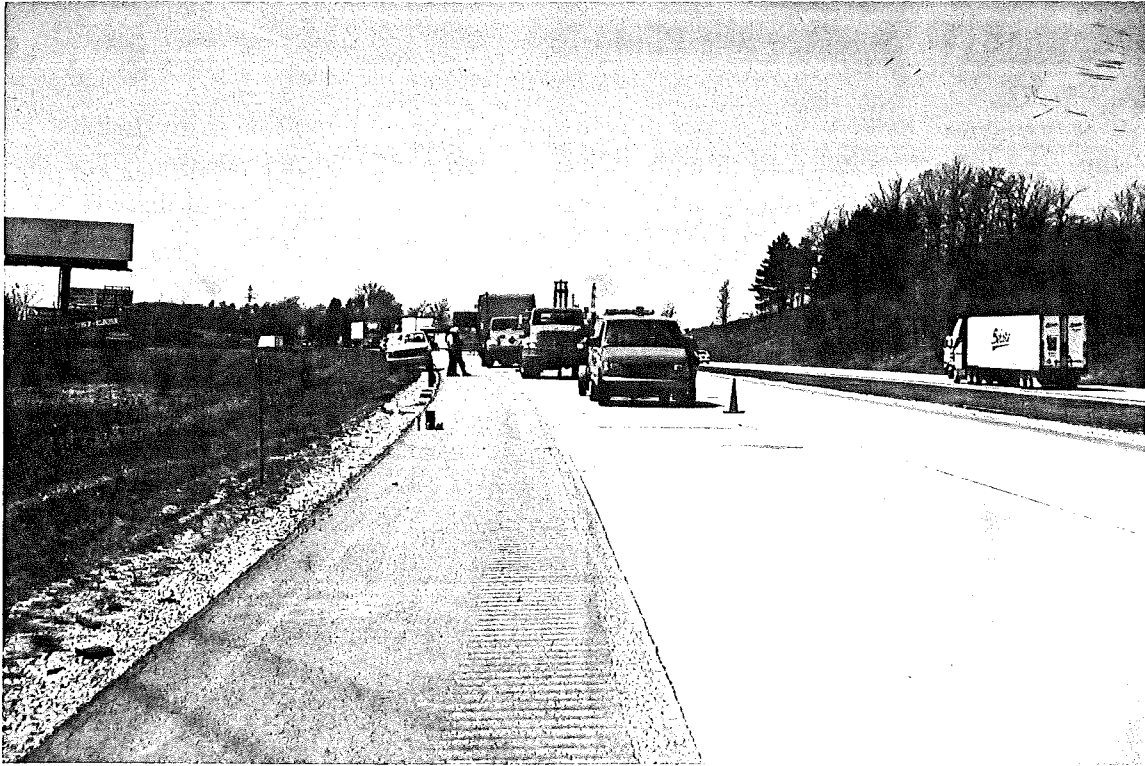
An overview of CSN# 11017-32516A (Section A), EB looking west. The 14 ft widened truck lane design and asphalt shoulder can be seen.
